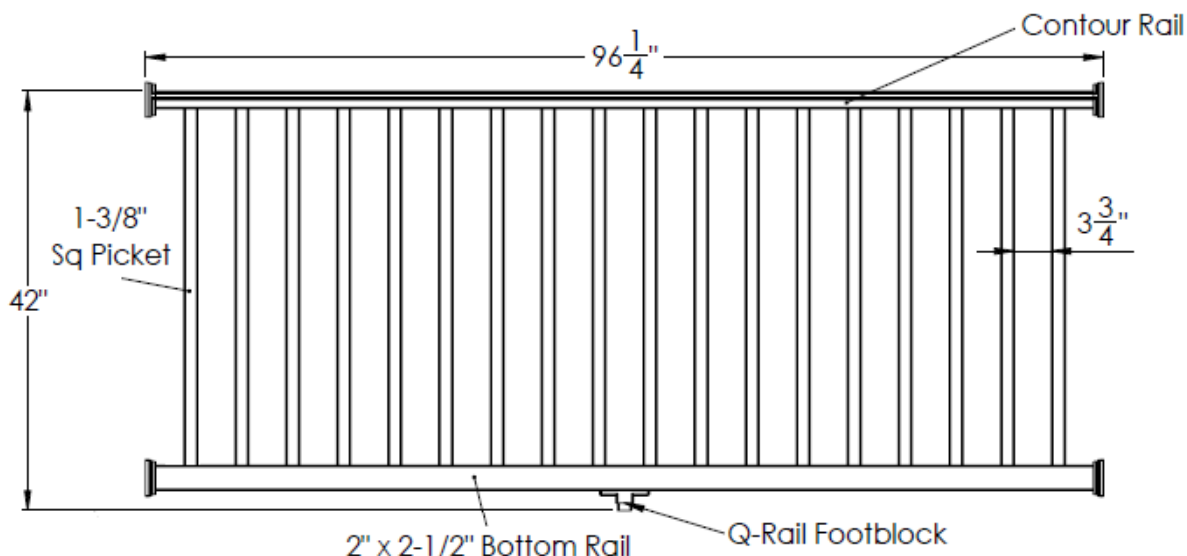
TYPICAL 8' x 42" QUANTUM RAIL LEVEL RAIL KIT
